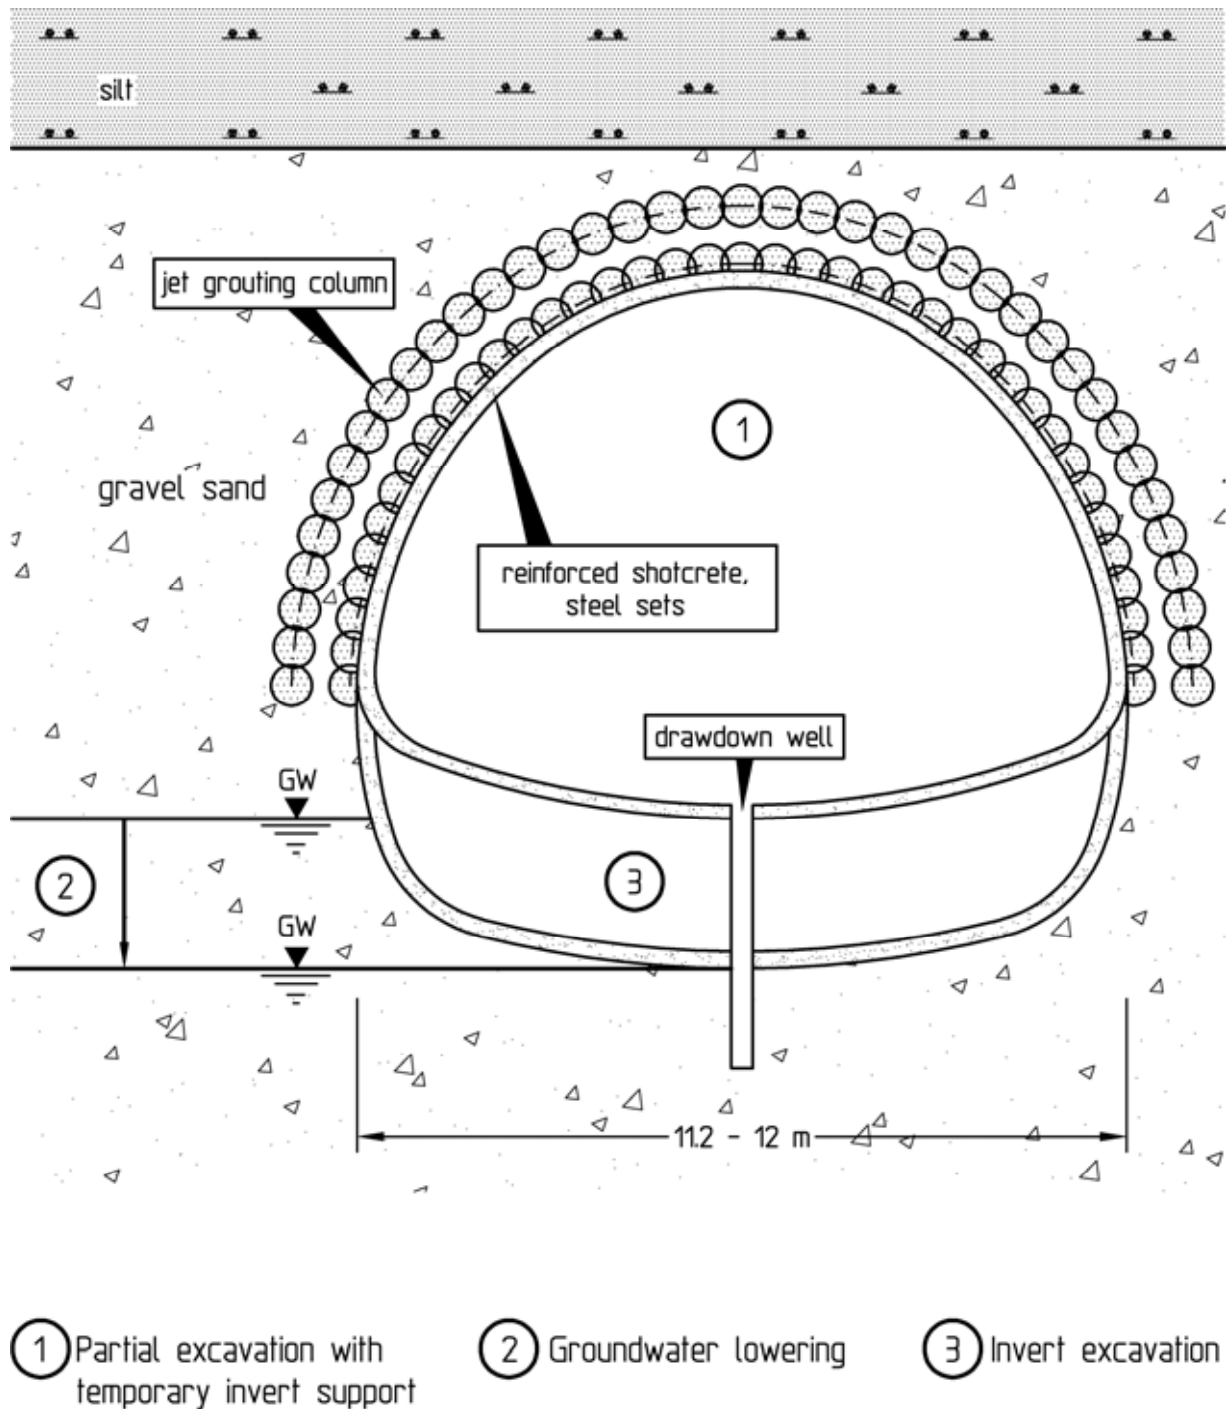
Heading of the two-lane tunnels, excavation and support, cross-section
